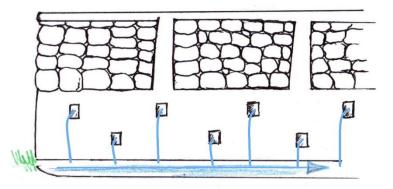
Drainage holes in a dry stone wall built with mortar.
